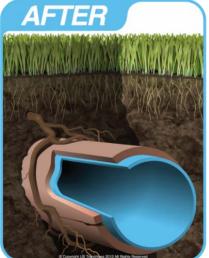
New lining could be installed in existing pipes (Drawing courtesy of U.S. Trenchless [2020], all rights reserved).
